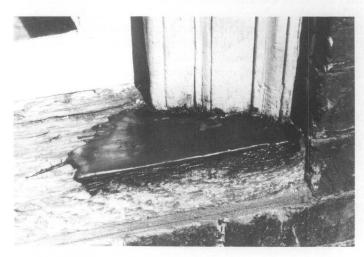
This illustrates a two-part epoxy patching compound used to fill the surface of a weathered sill and rebuild the missing edge. When the epoxy cures, it can be sanded smooth and painted to achieve a durable and waterproof repair. Photo: John H. Myers
